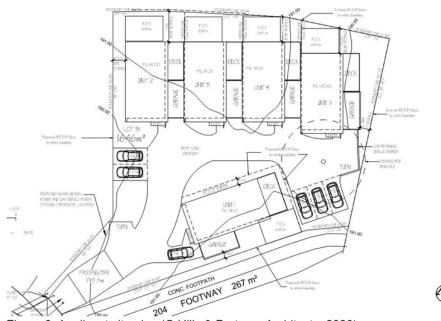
Applicant site plan (G Hills & Partners Architects, 2020)
